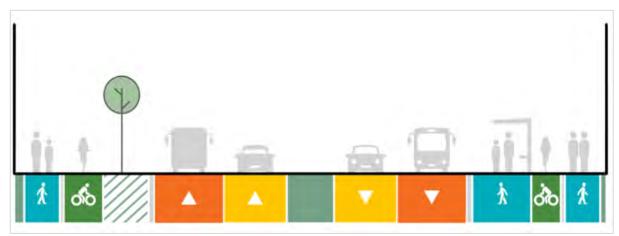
Don Buck Road Upgrade Typical Cross Section
